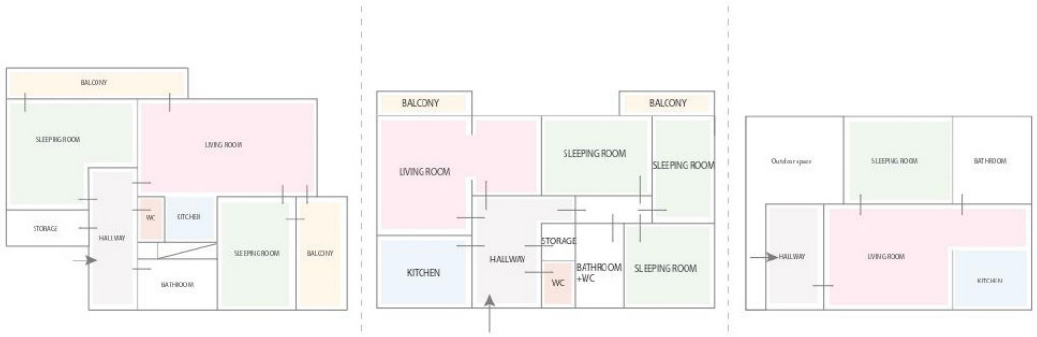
Housing layout for typical Dutch, Syrian, and Eritrean houses.
